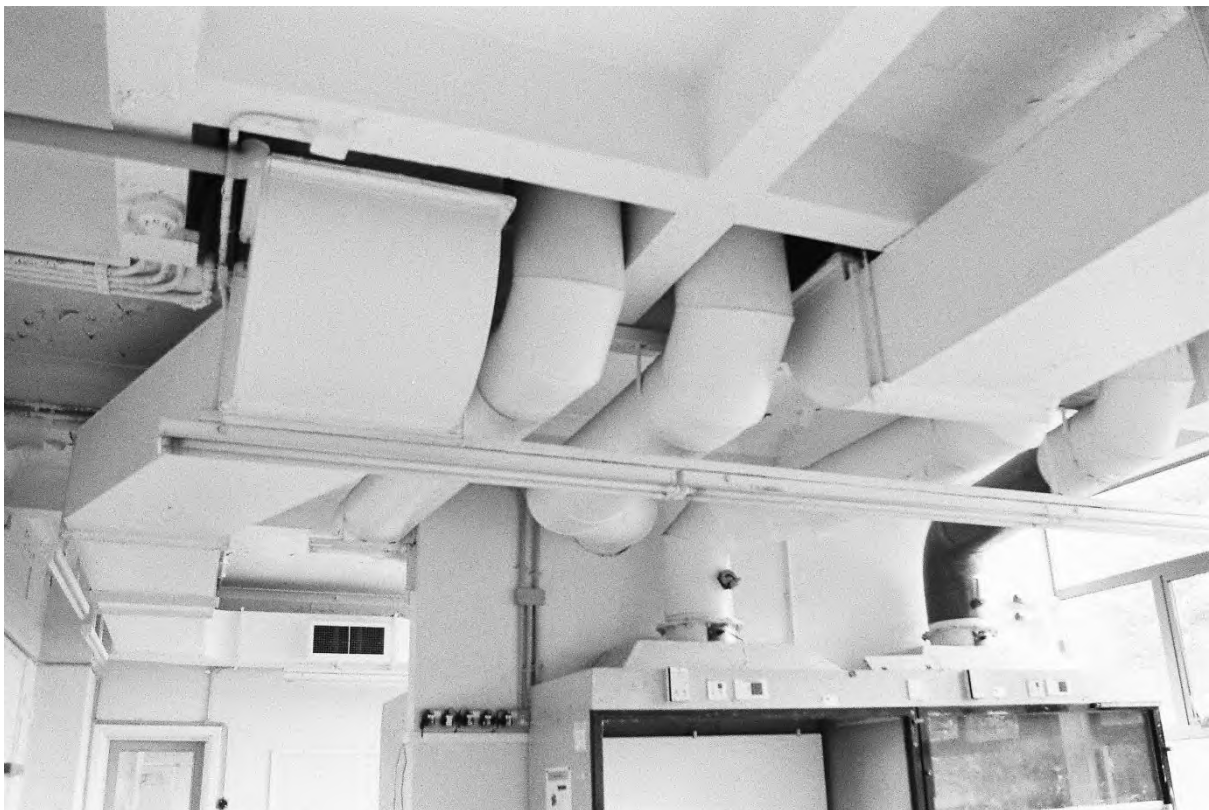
Block B: Interior First Floor Room B88 (Swinden3_32). Facing North-west.
